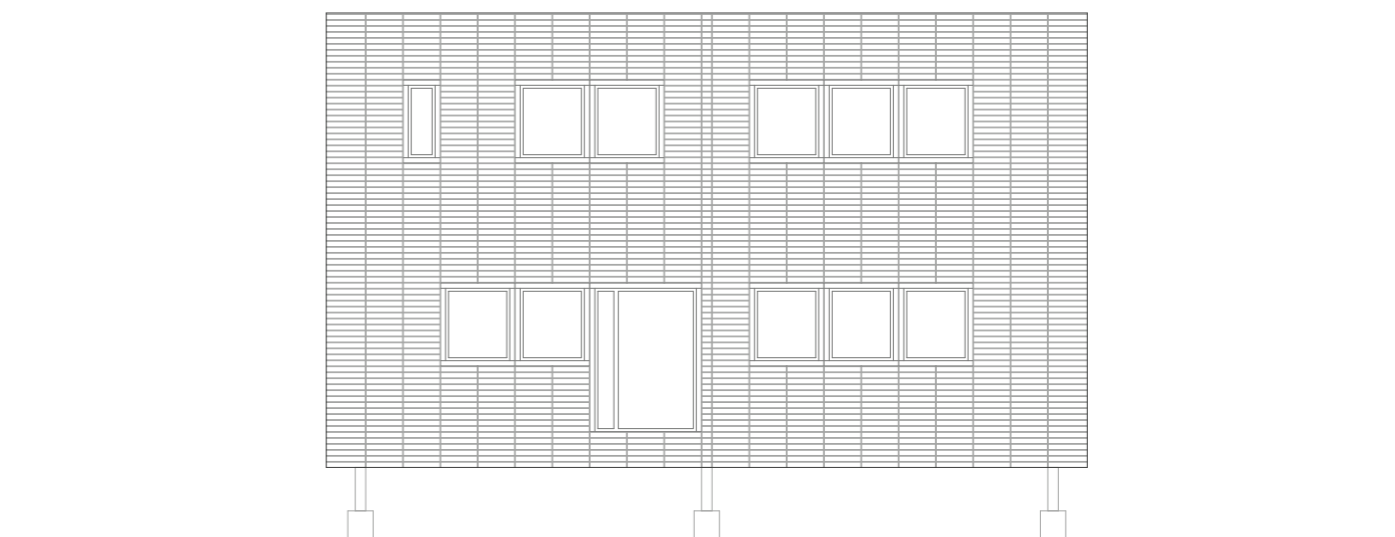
Drawing, Elevation - Six persons house - 1:100. ©Personal illustration.
